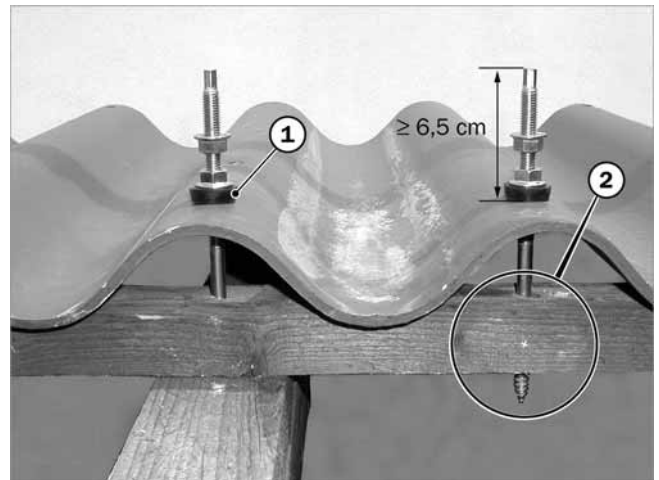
1 screw in the rafter, 1 screw in the batten (Method B)
